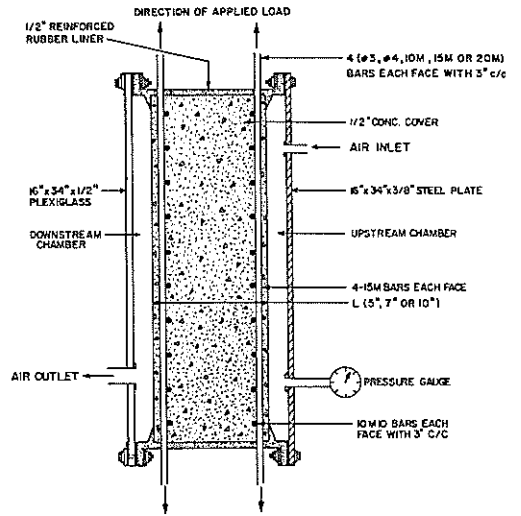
Details of air chambers and rubber liners of leakage specimen.
